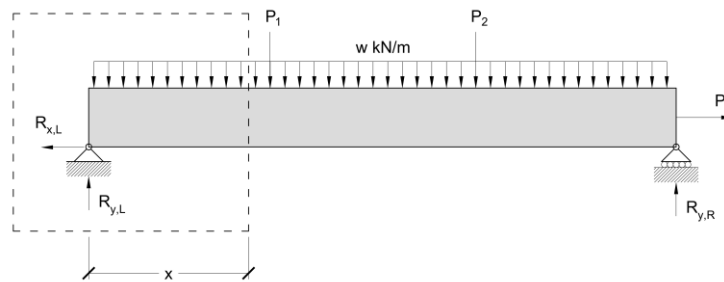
Simply supported beam subjected to arbitrary loading conditions:
